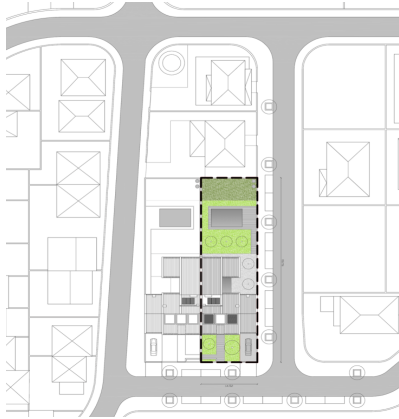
(a) – Plant and perspective view of single-family two-story dwelling
